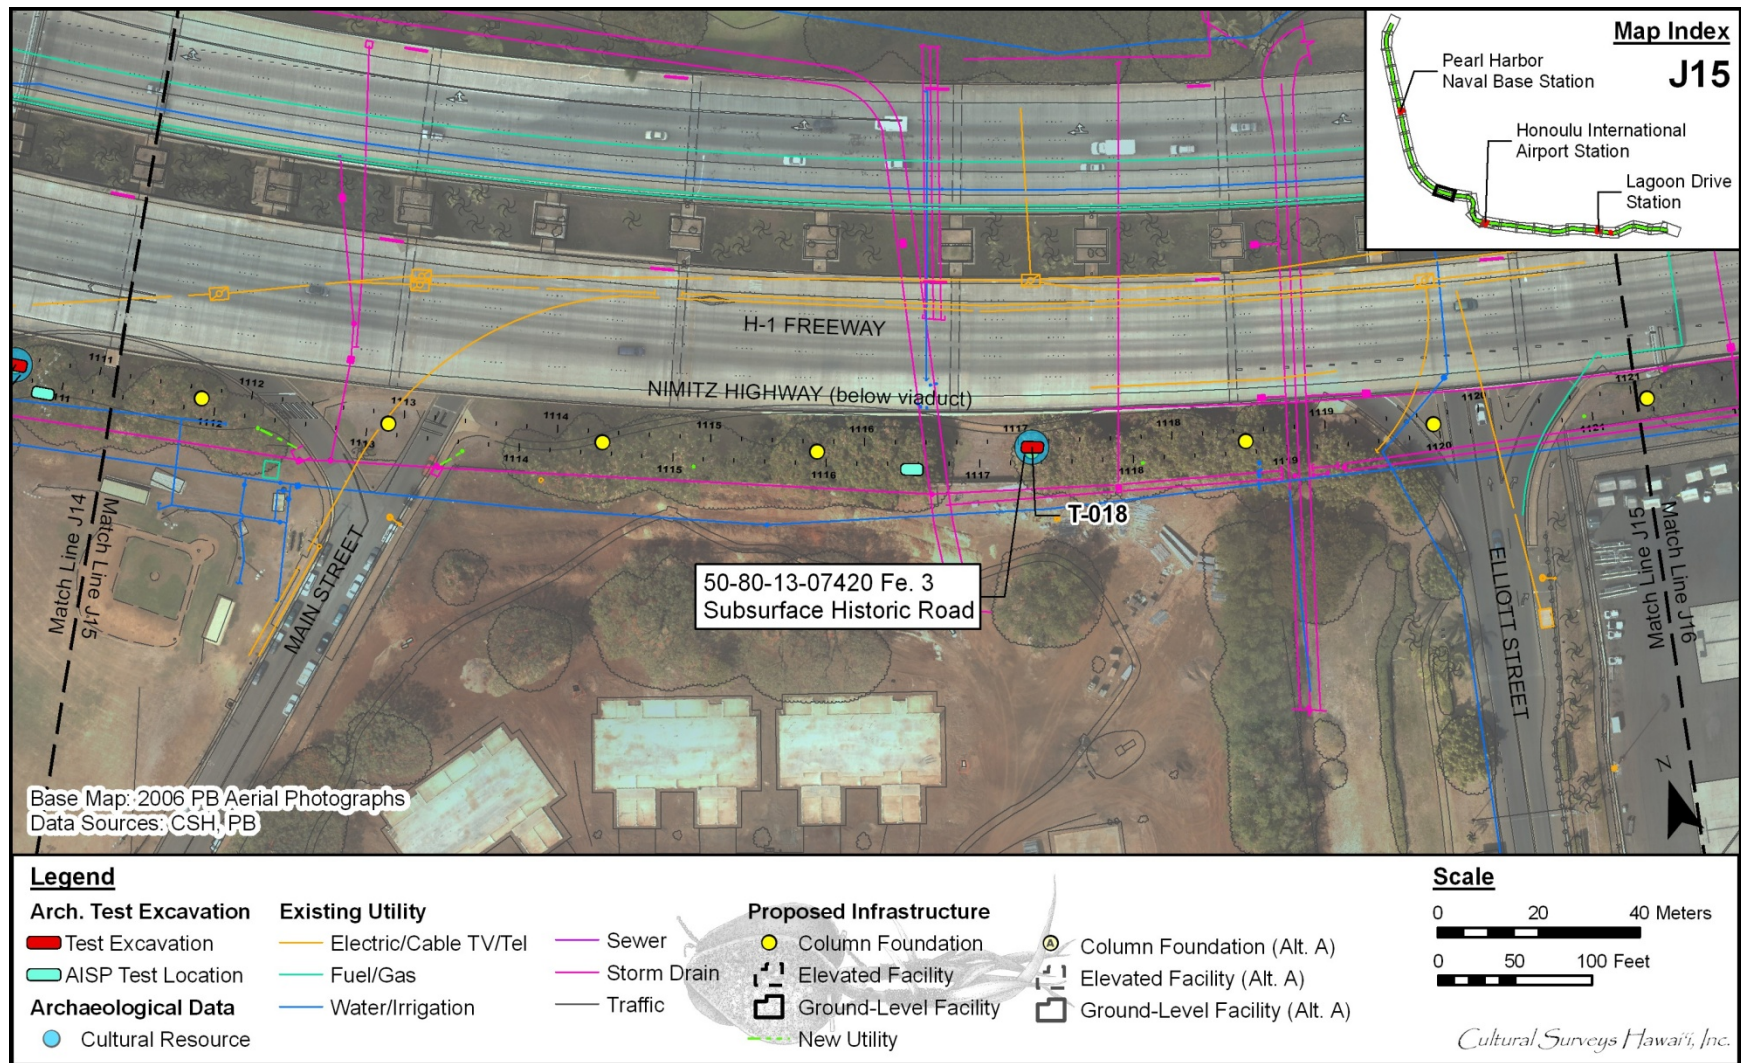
Map Sheet J15, one test excavation (T-018) at column foundation @ 1105+20
